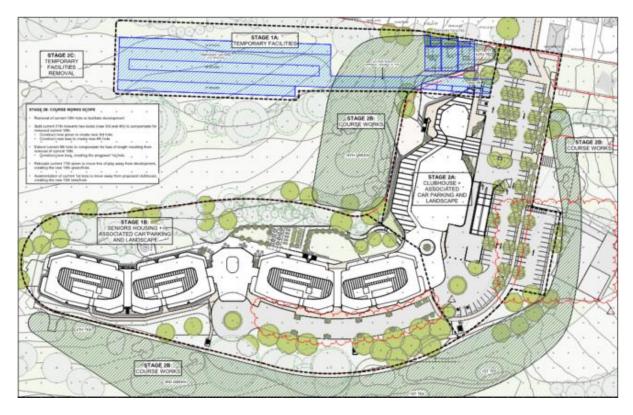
Proposed Staging Plan (Source – Architectural Plan Set, Marcheses Partners)
